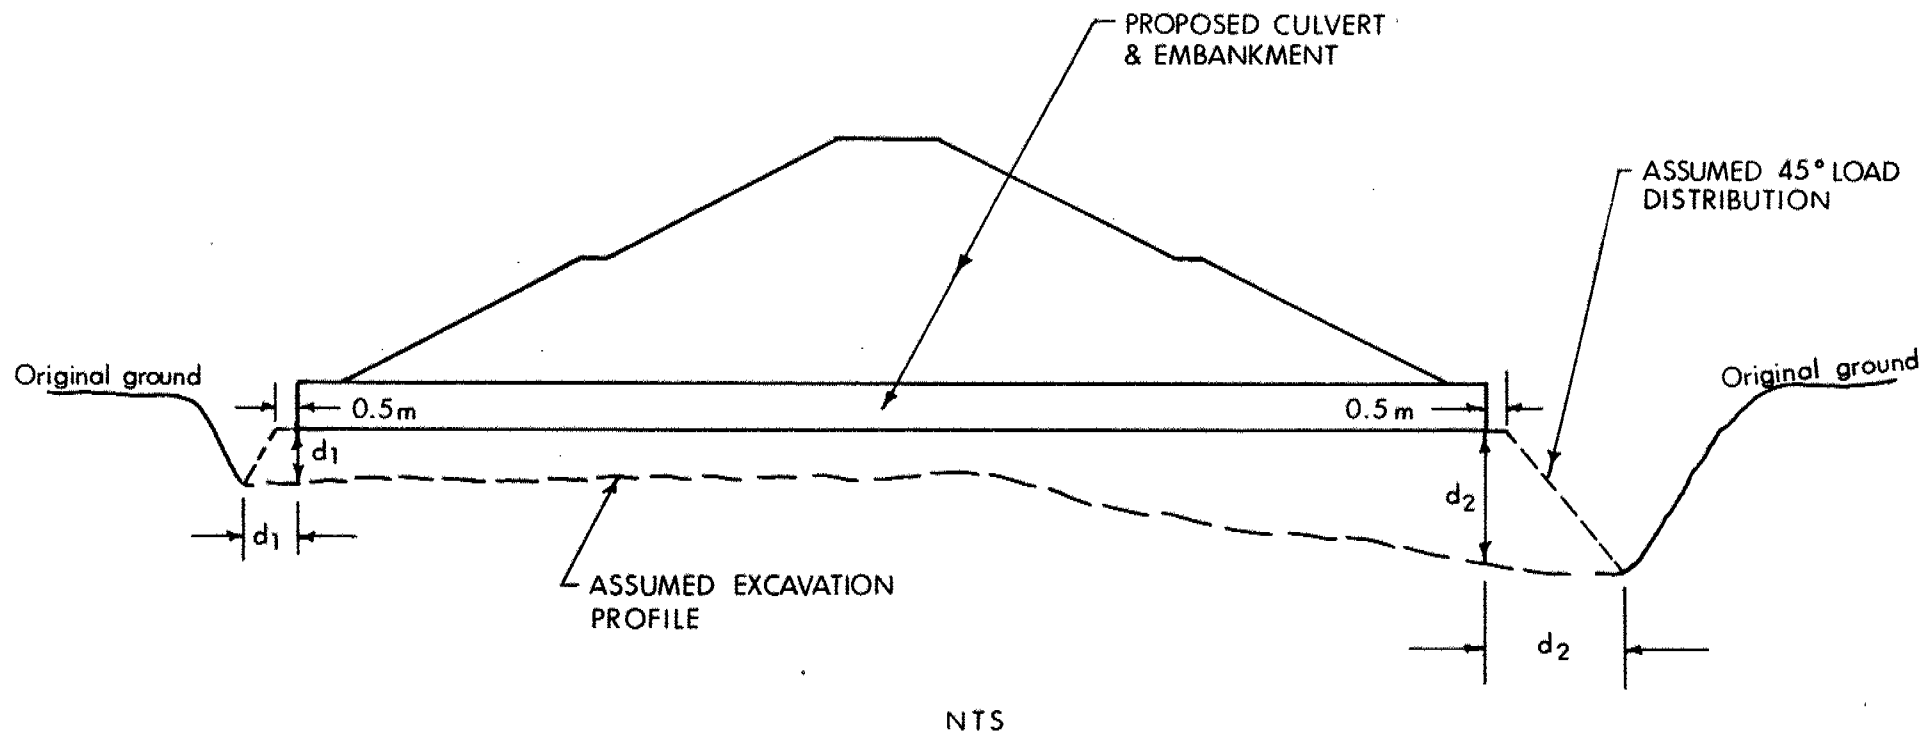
LONGITUDINAL SECTION SHOWING SUBEXCAVATION PROFILE
